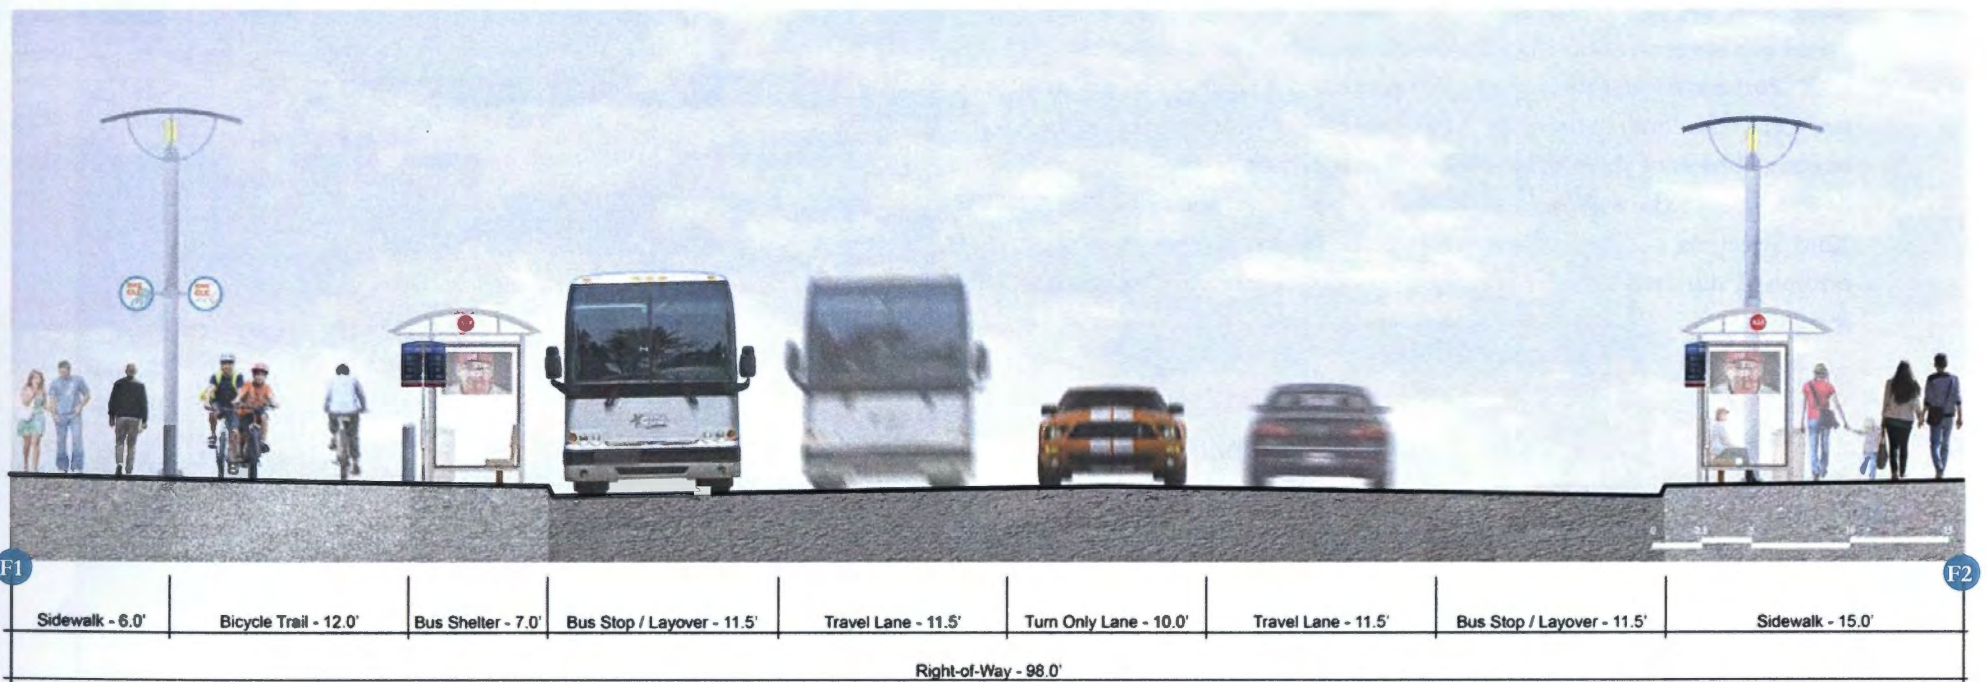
Prospect Avenue between West 3rd and 6th Street Proposed Section
